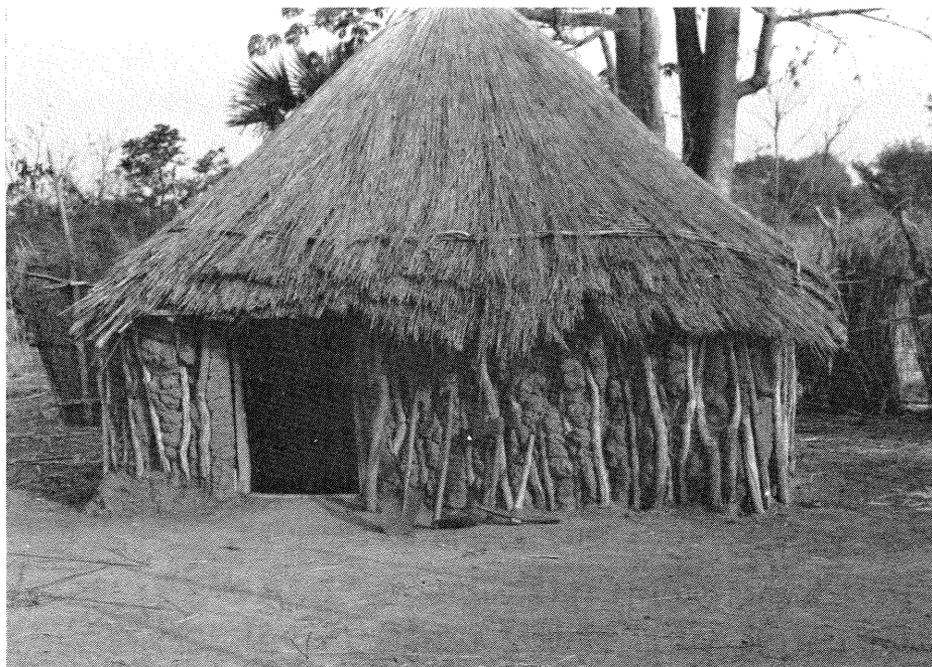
Typical Hut (Road Camp #2) Tonj-Wau Road
